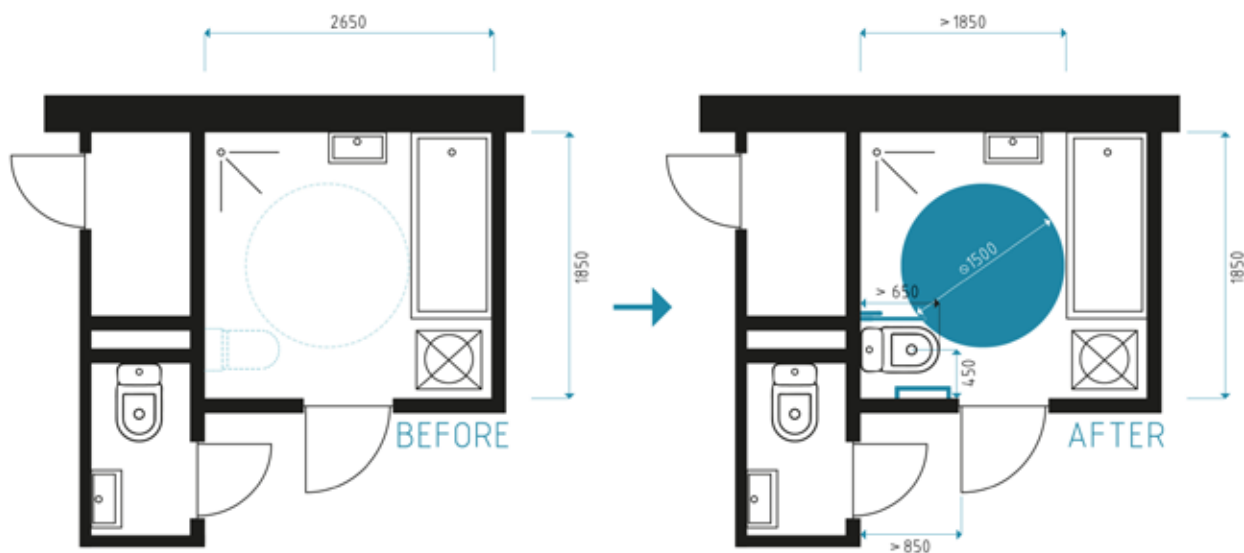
a, b Location of the installation core allows the additional implementation of another toilet in the bathroom to create an accessible bathroom (Rollová, Suláková)
